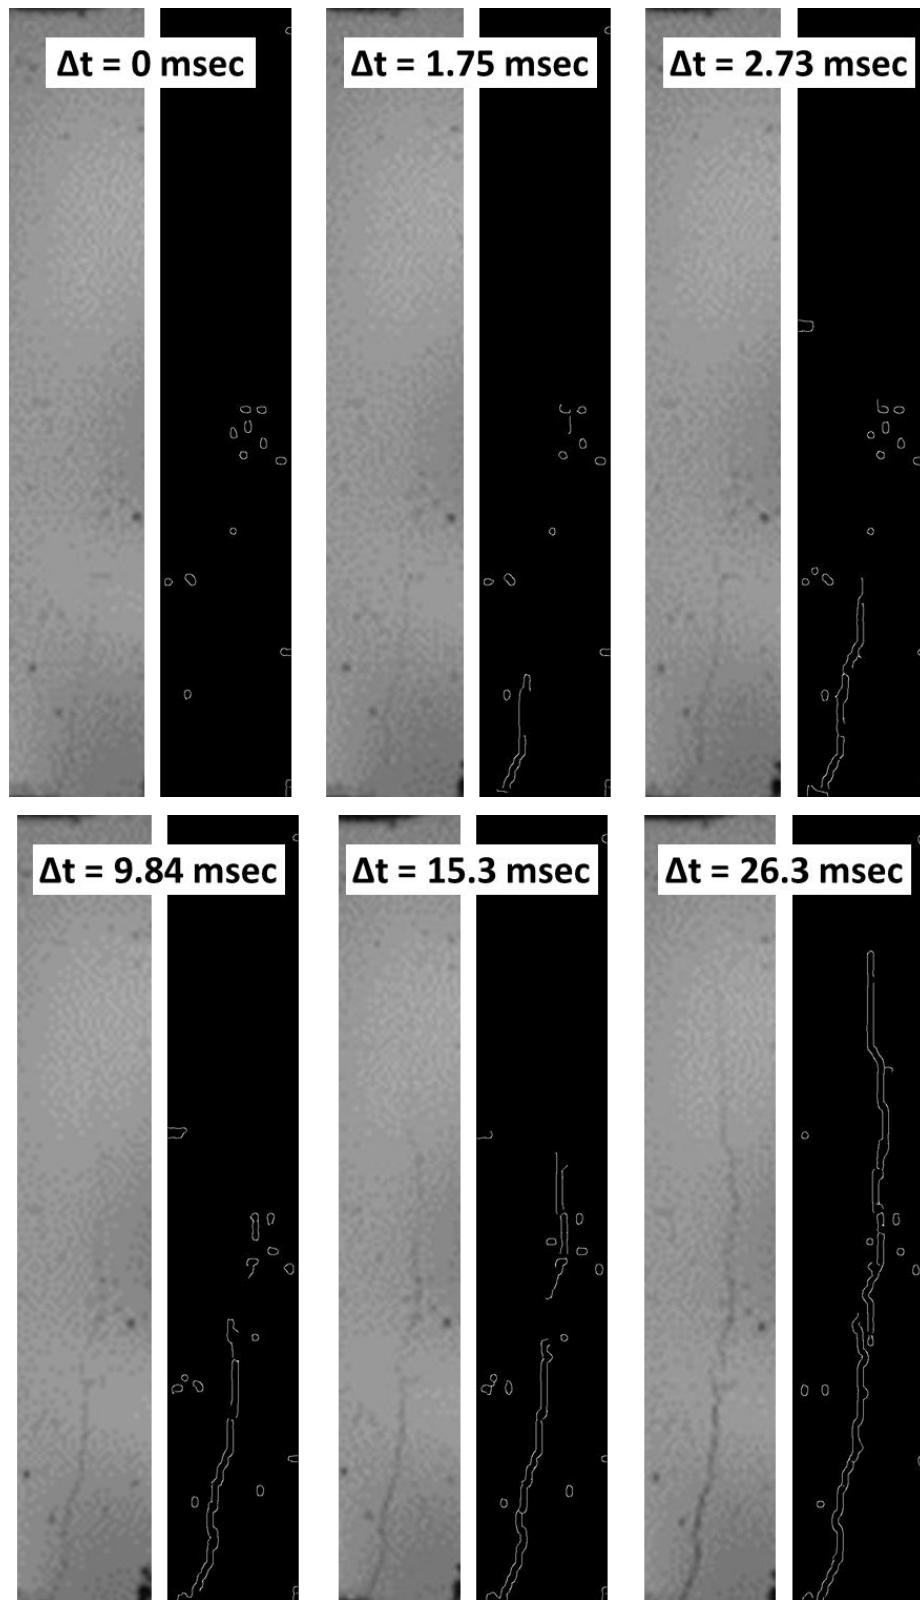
Example of crack edge detection in a CS-1.0% specimen for 7.6 mm/sec loading speed (using the MTS machine)
